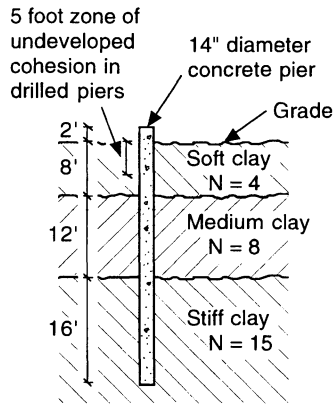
Example 8-3—Concrete pier in clay.
